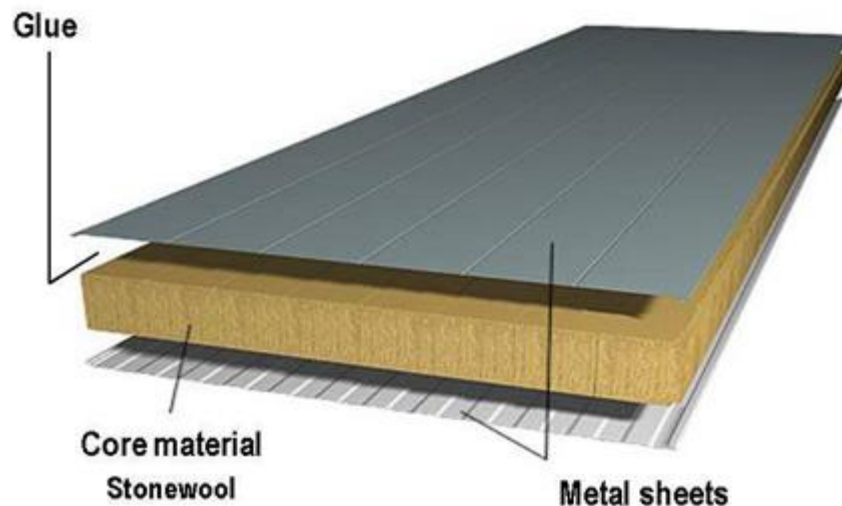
Sandwich panel (thin faced, made of metal sheet) with stone wool core material (sandwich construction)
